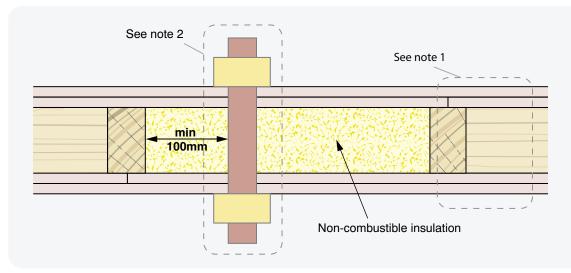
Plastic pipe penetration through fire-protected timber-framed walls with non-combustible mineral fibre insulation.
